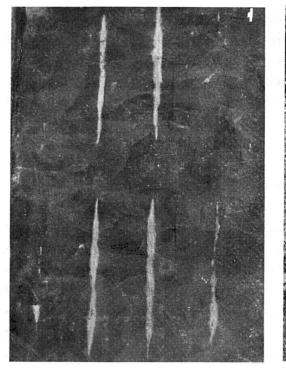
The Steel Deck-Plate After Removal of 1-in. Surfacing. Note the Corrosion After 4¹/₂ yr. Owing to Water Penetrating Through the Cracks Shown Above.
